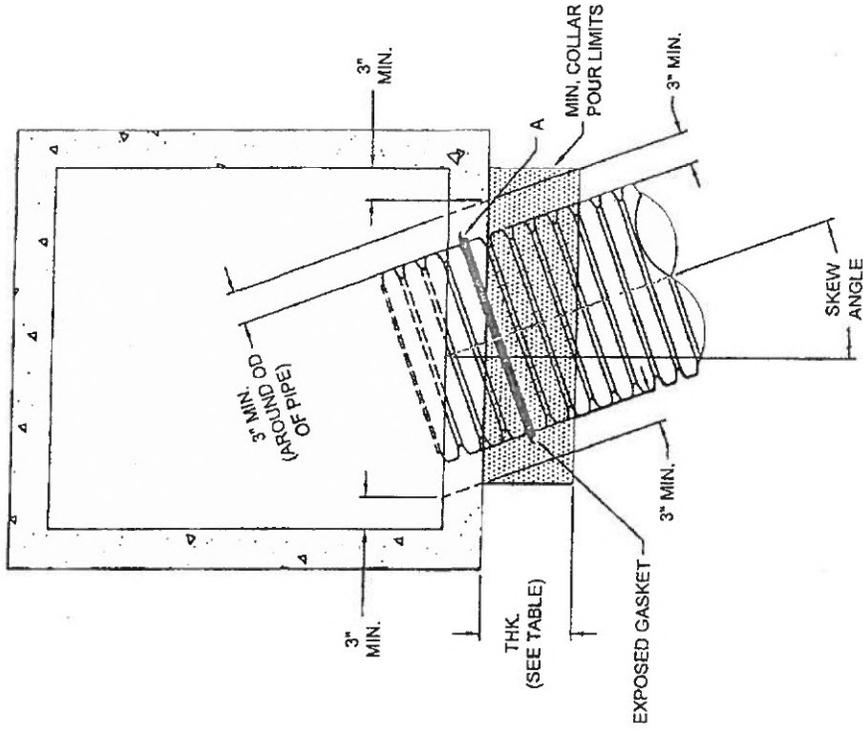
DETAILS FOR NON-SHRINK GROUT COLLAR FOR SKEWED HDPE PIPE TO STRUCTURE CONNECTIONS.
